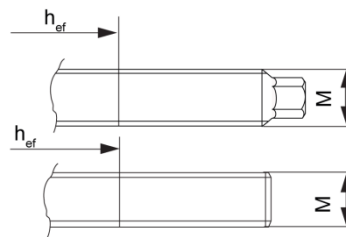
RSB ANCHORING SYSTEM & RGM
